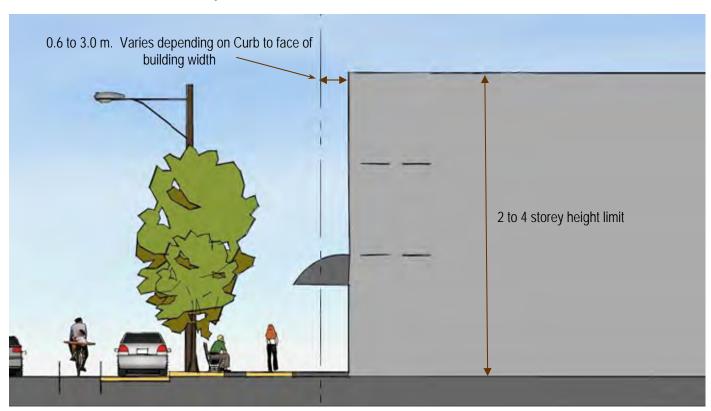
Building setback may vary depending on the character of the street, the adjacent development and the boulevard width of the street it is fronting on to ensure a good pedestrian realm.
